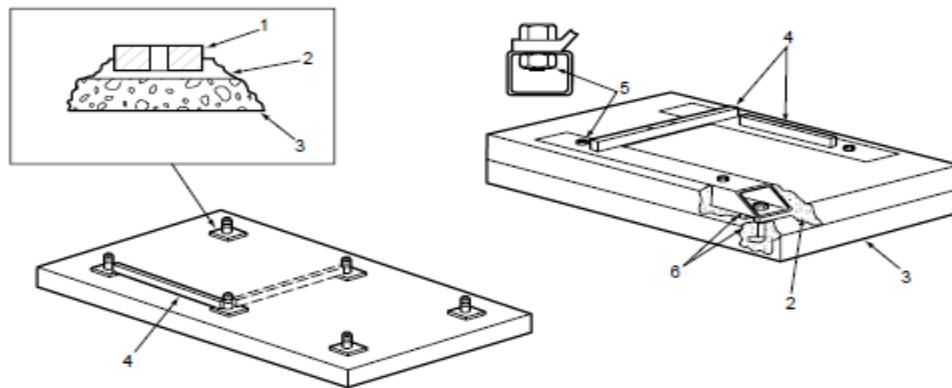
Foundation Bolt Installation and Grouting [Dimensions are in mm]
